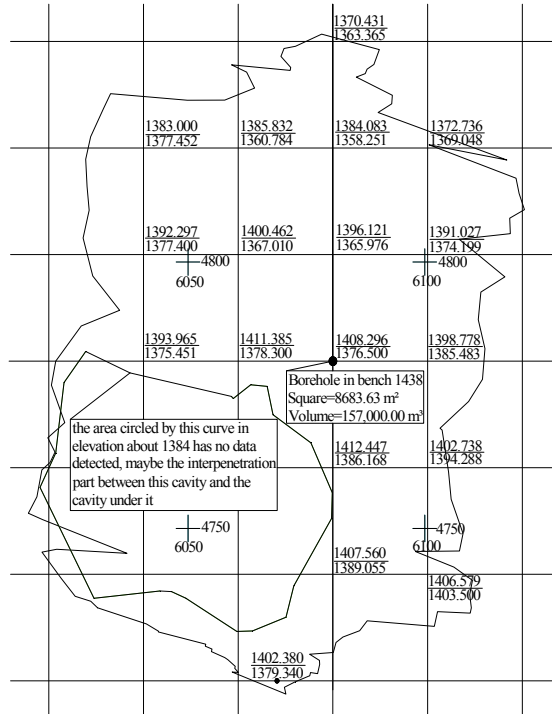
Cavity ichnography with roof and floor elevation of grid intersection point
